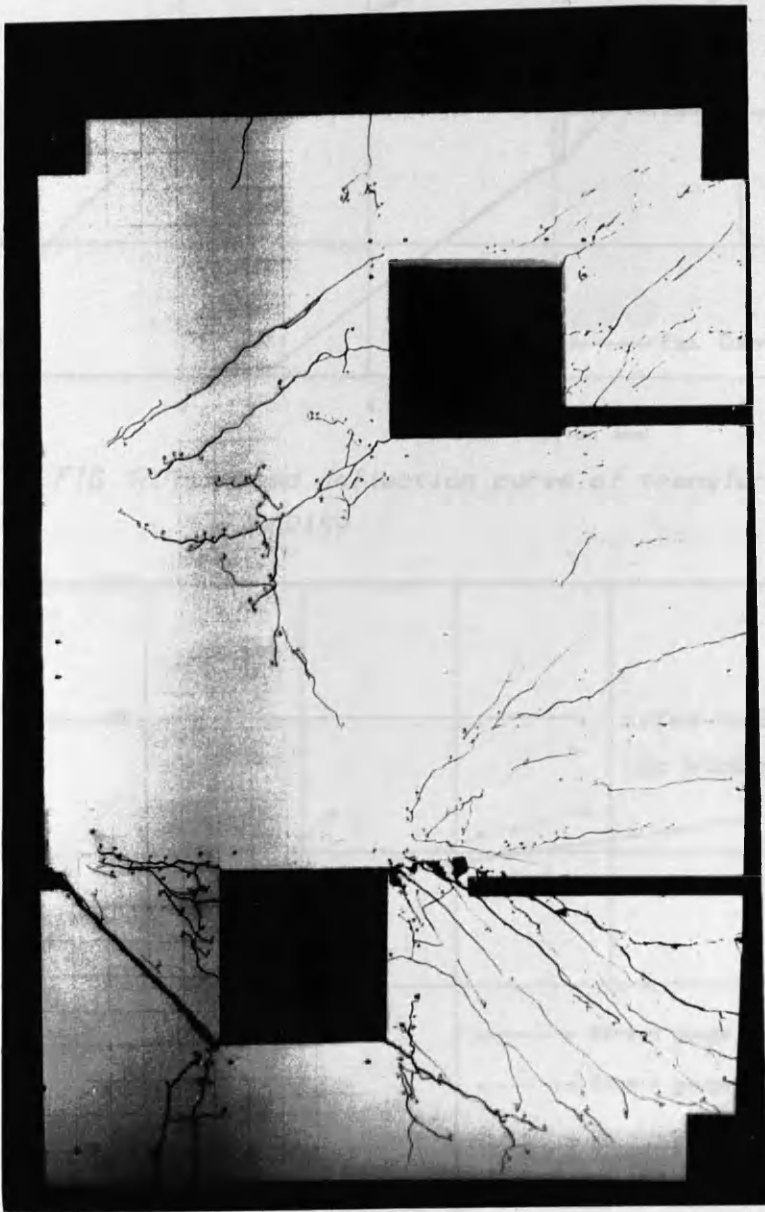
Failure mechanism of girder TRGRAS9
